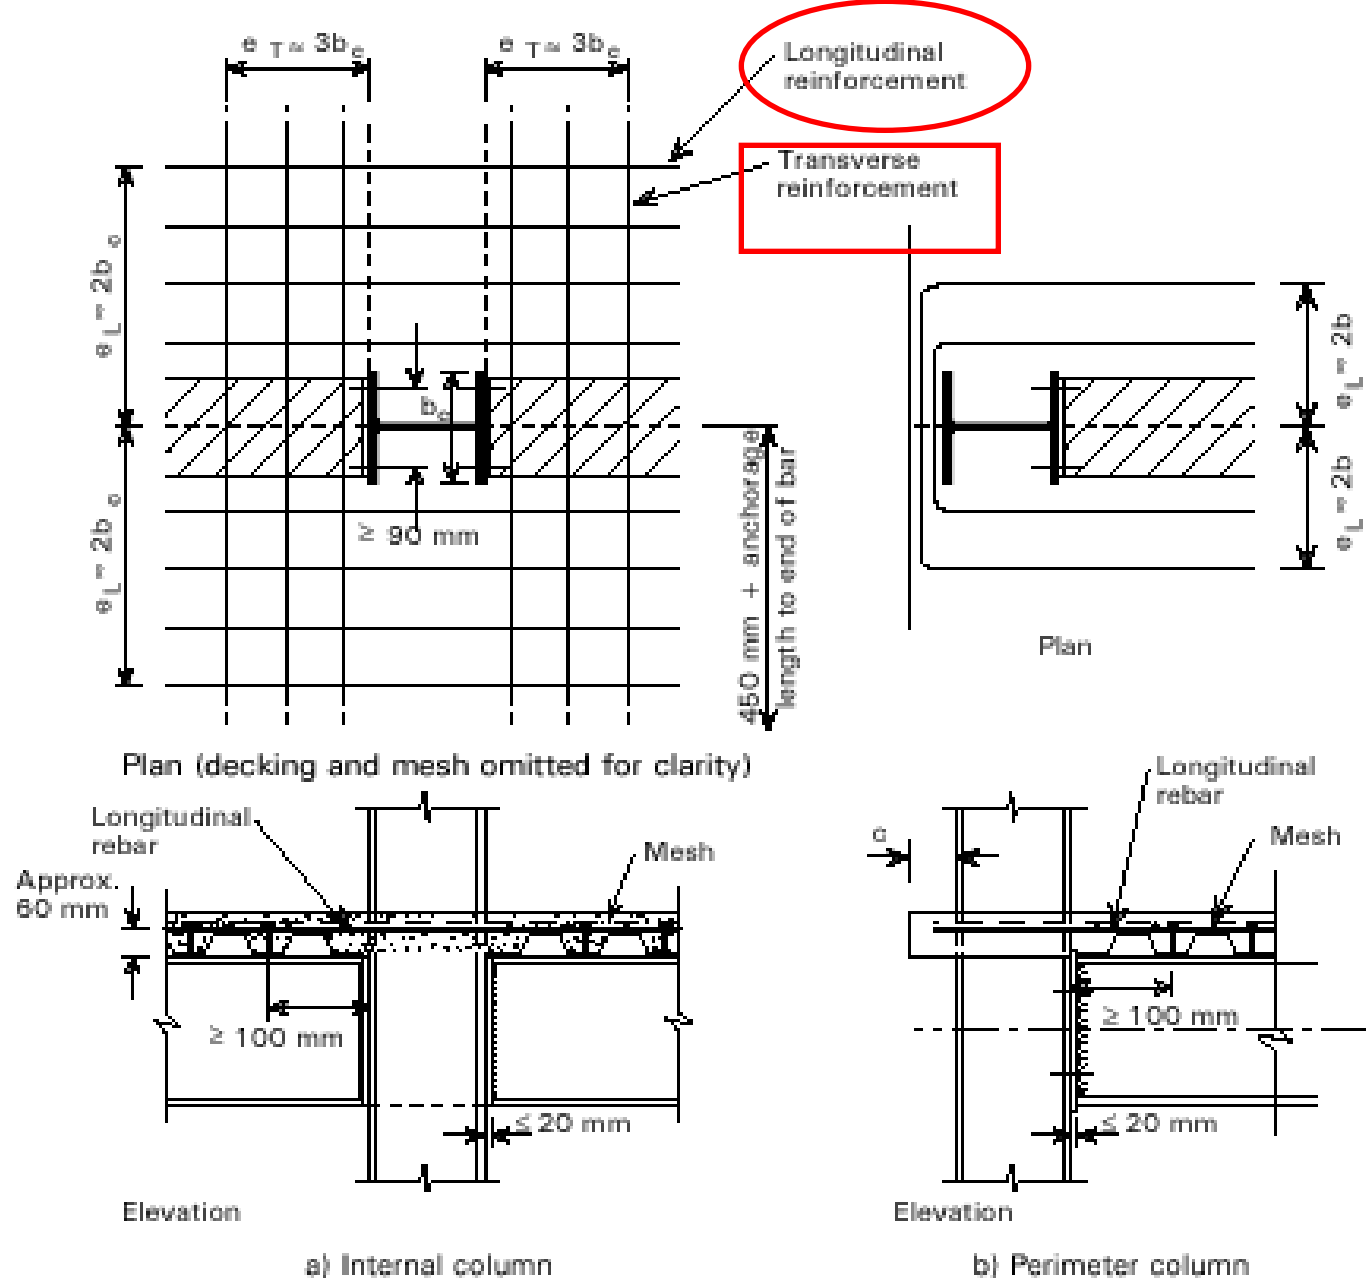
Geometrical detailing rules - beam-to-column composite connections
